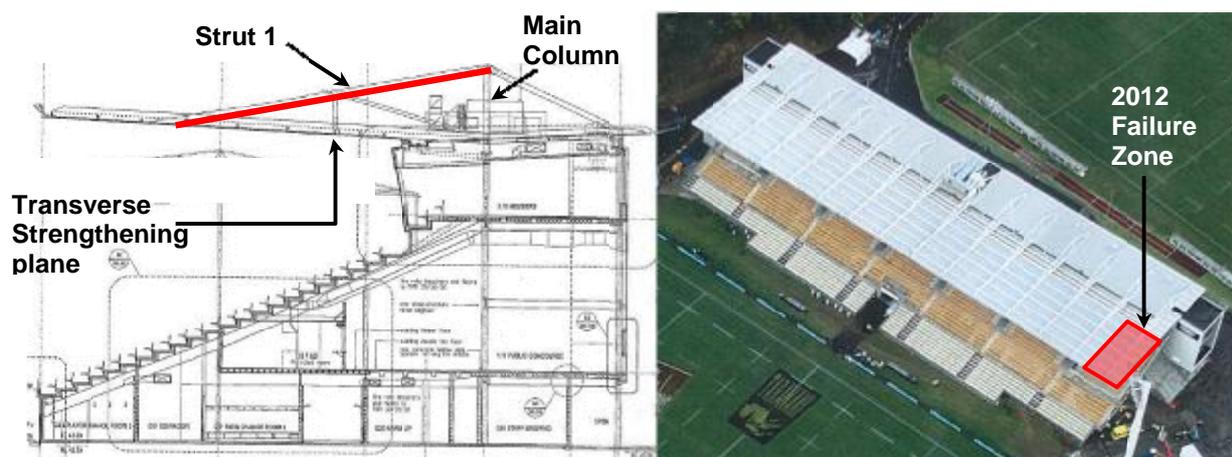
& 3 – TSB Stand Typical Section and Perspective View
